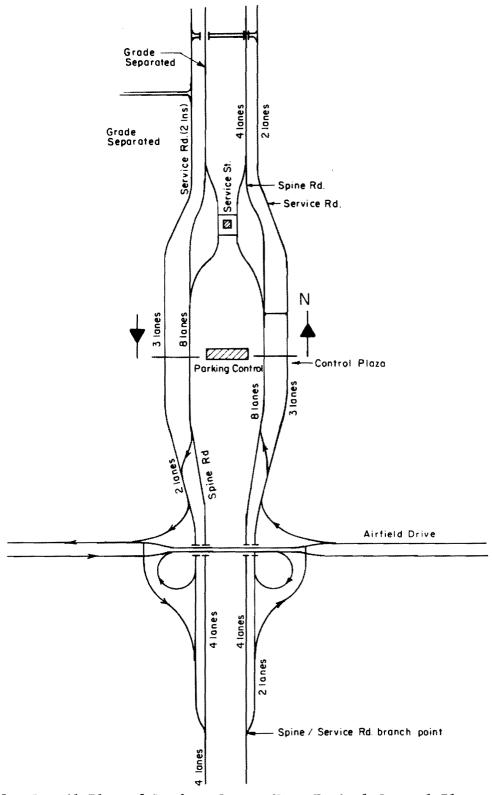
Detail Plan of Roadway System Near Typical Control Plaza Area.
